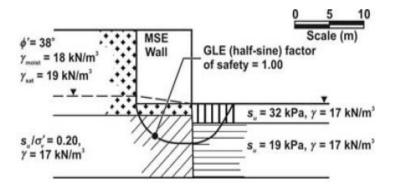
Deep seated failure observed at site KM 26 due to failure of foundation soil (Roy 2008)
